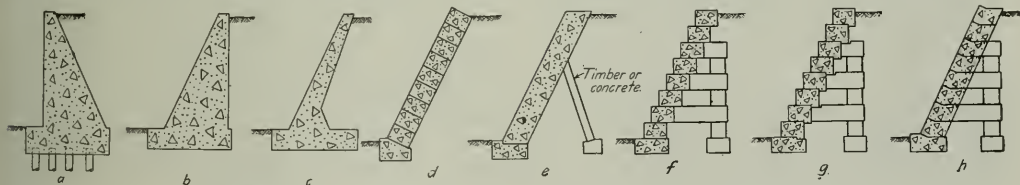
Various Types of Retaining Walls Considered for Use on Soft Foundations
